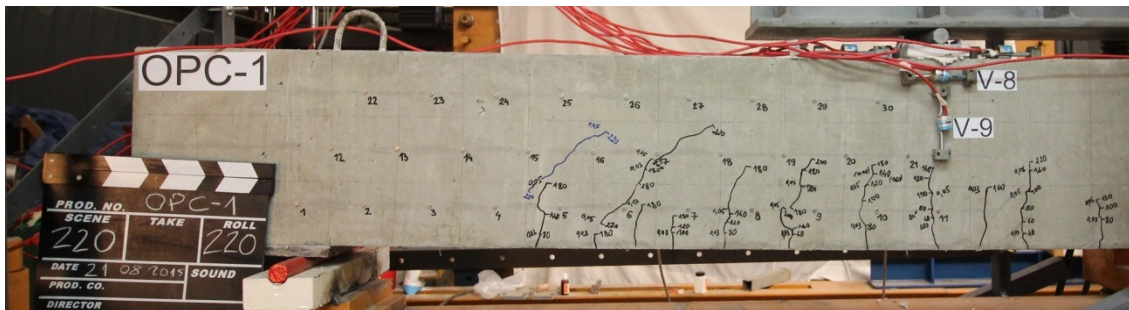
Crack pattern on the front side of OPC-1 beam just before failure
